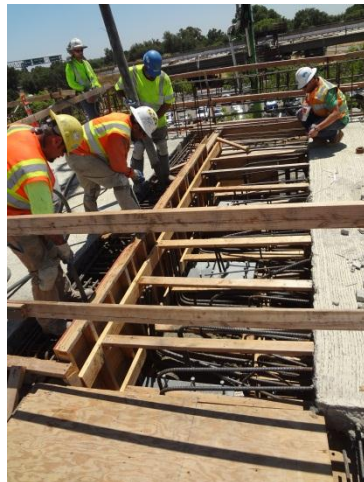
Construction of in-span hinges in CIP/PS box girder bridge
